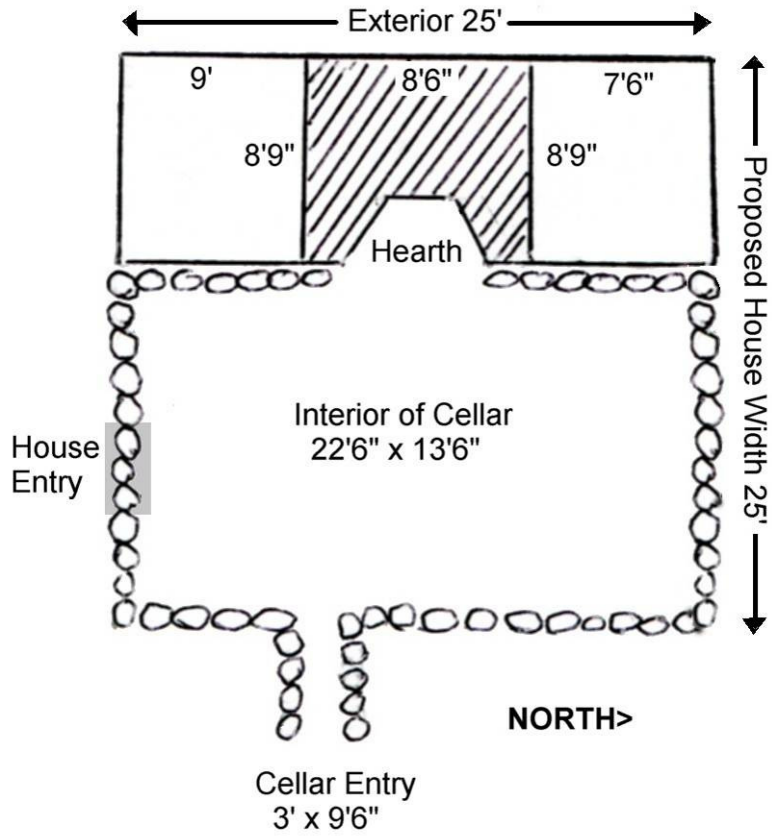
Proposed layout of the first floor of Nathaniel Adams East Side House (not to scale)
